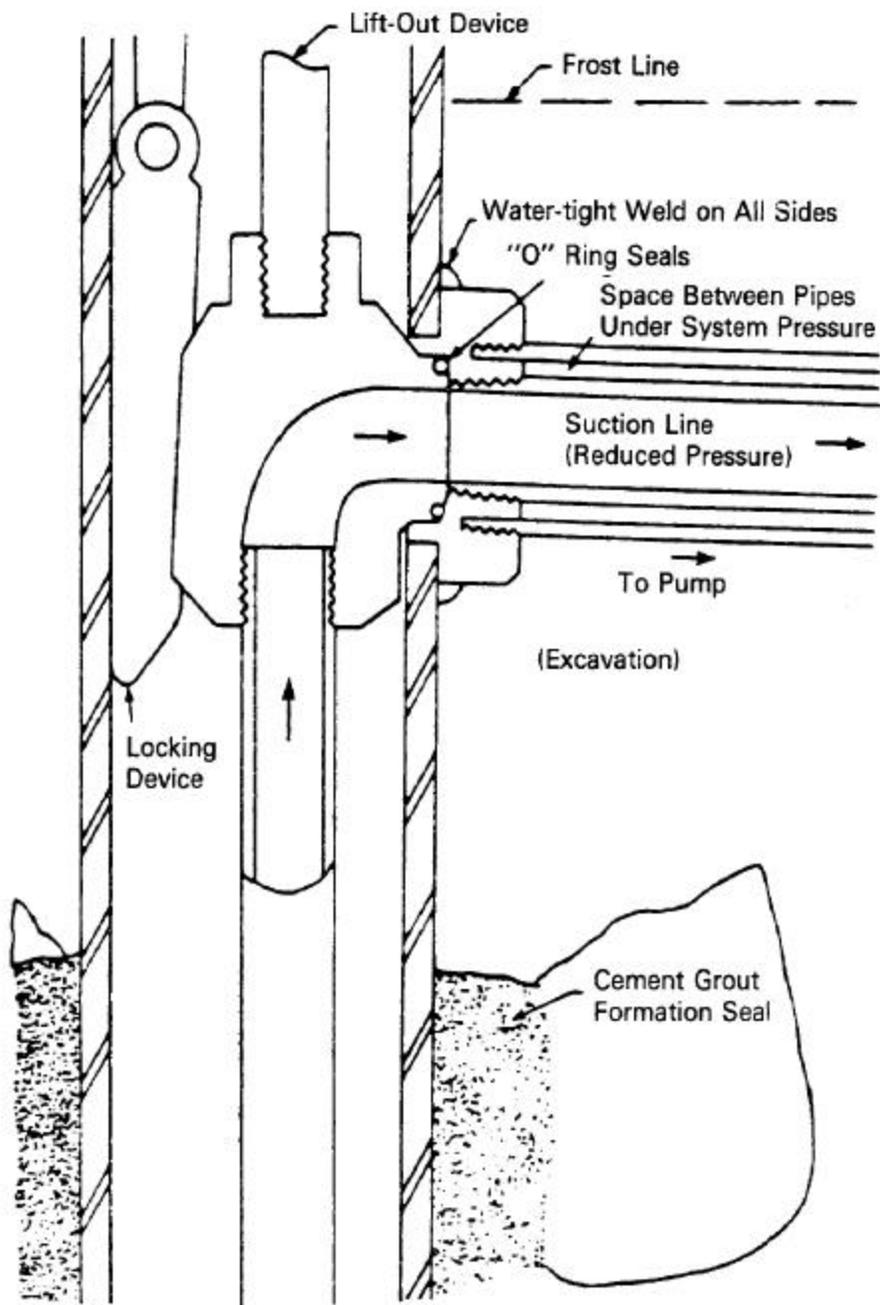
Weld-on Pitless Adapter with Concentric External Piping for "Shallow Well" Pump Installation
